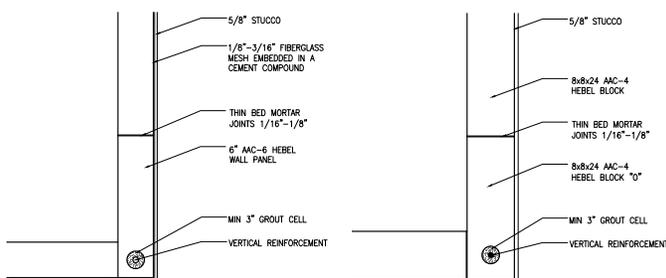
Hebel Panel (left) and Block (right) AF2.0 exterior wall plan details
